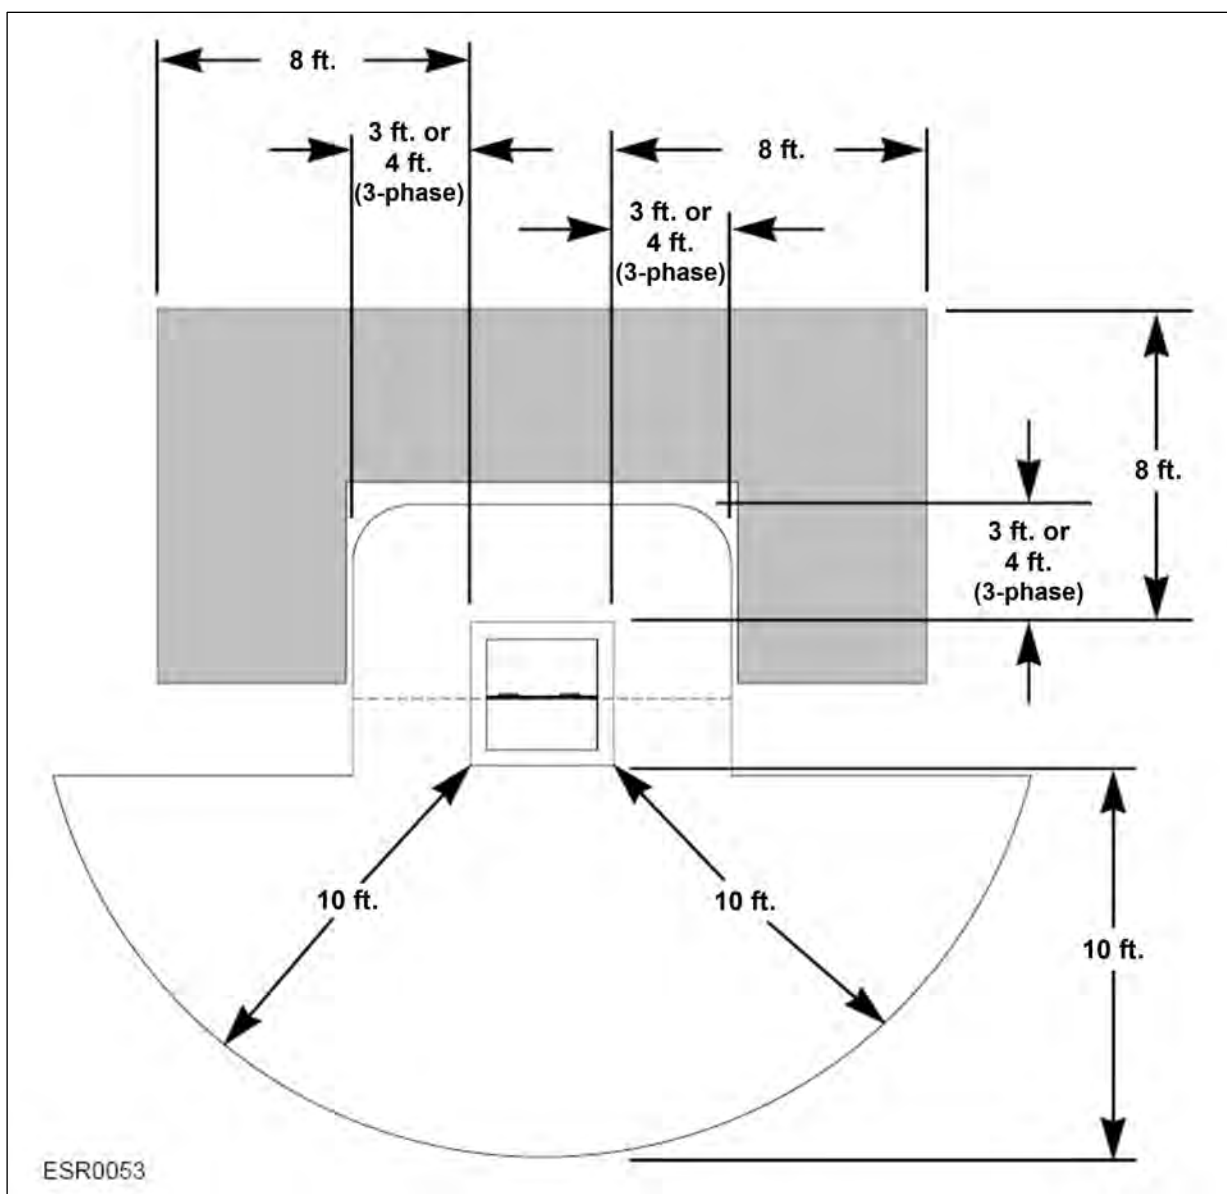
Working Clearances Around Pad-Mounted Electrical Equipment Adjacent to a Combustible Structure
